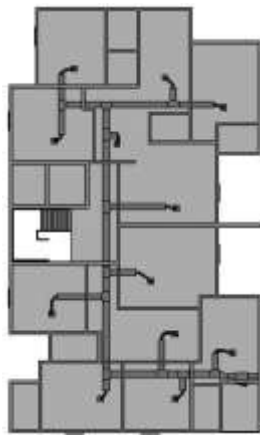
Actual Revit Plumbing layout of floor plan showing soil stack position and branch connection
